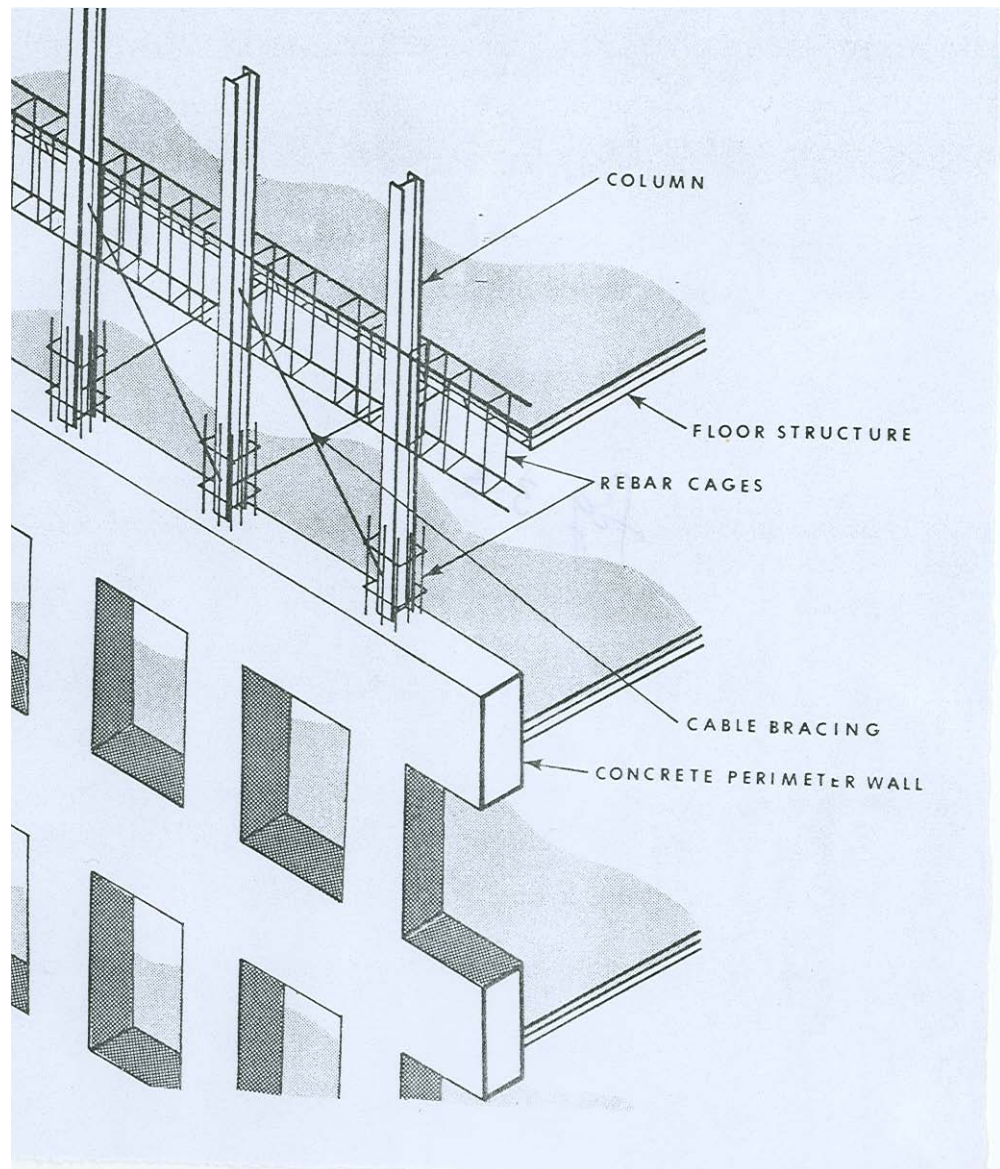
Schematic sketch of a Tubular Composite Building [3]
